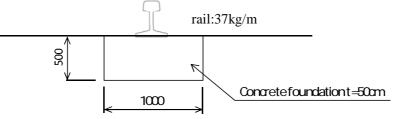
Gantry crane 80t Rail foundation
